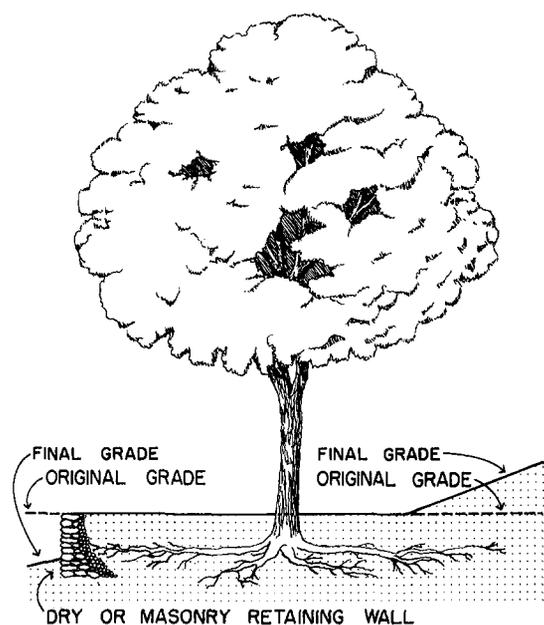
Change of grade from level to sloping showing the use of a retaining wall around the tree roots.
